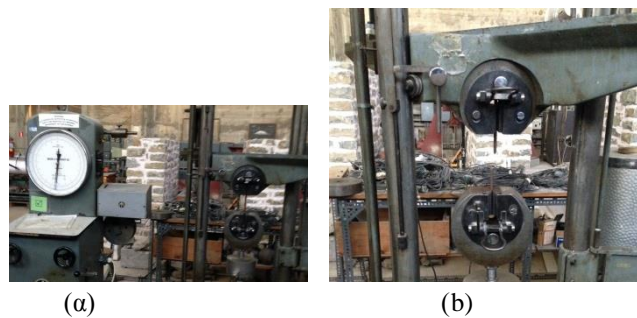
a) Tension Test, b) Rebar Failure
